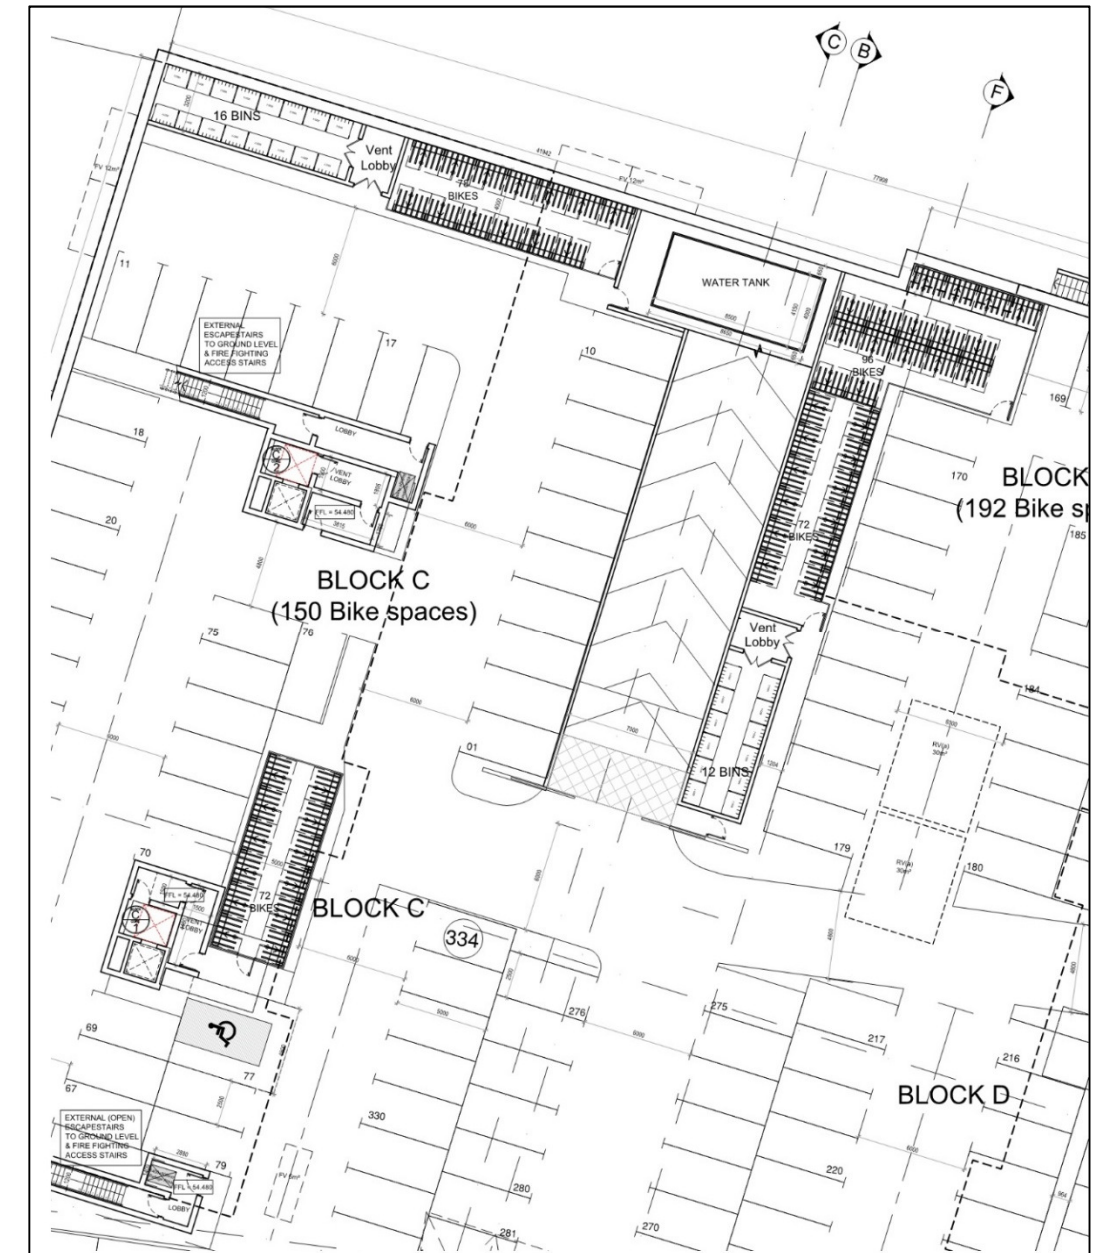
Extract of Basement Plan showing Car & Bicycle Parking.
